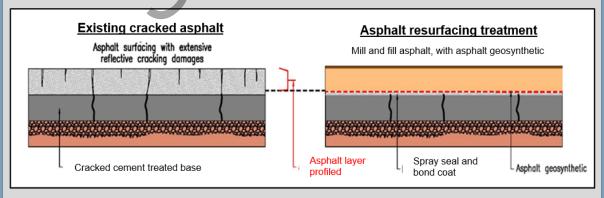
(e) – Example of a typical asphalt inlay (or 'mill and fill') reflective cracking treatment
